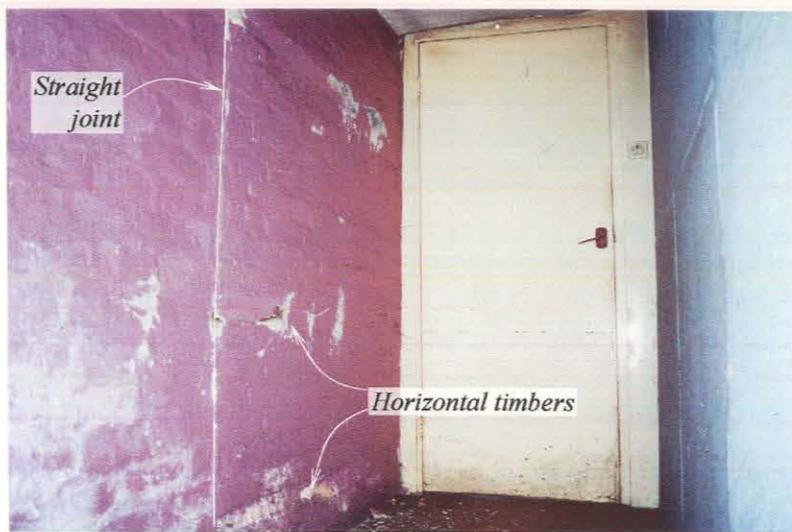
Hallway 65/2, no.65; looking west towards the doorway which leads into Kitchen 65/3. Note the straight joint in the brick wall on the left; this wall forms a division between no.64 and no.65.
